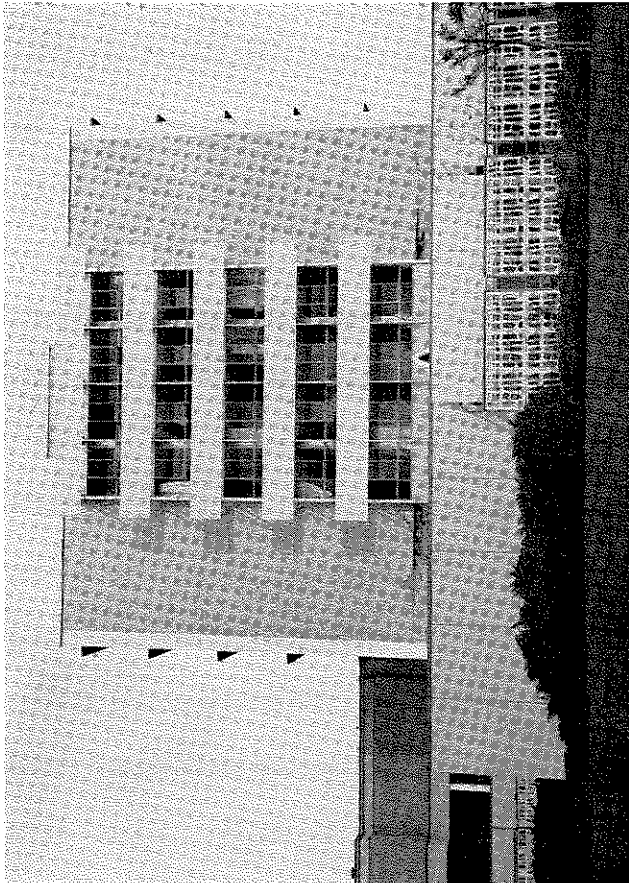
End walls at Holy Cross Hospital showing breaks at the third floor construction joints. Opposite view from Figure 3.67.
